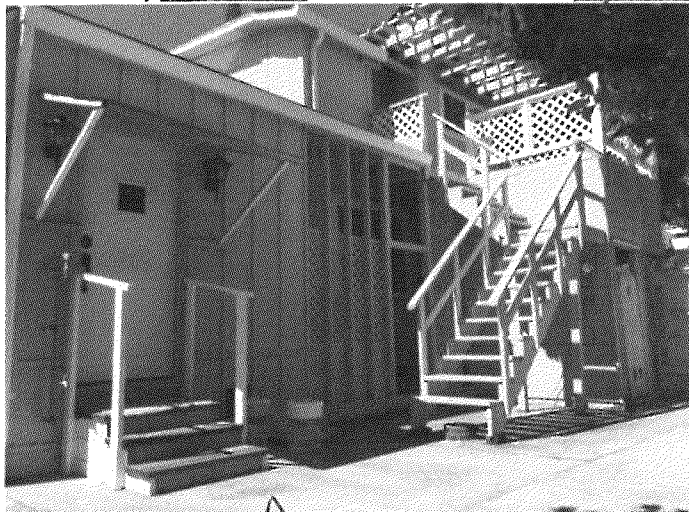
West and north elevations, camera facing southeast, July 31, 2017.
